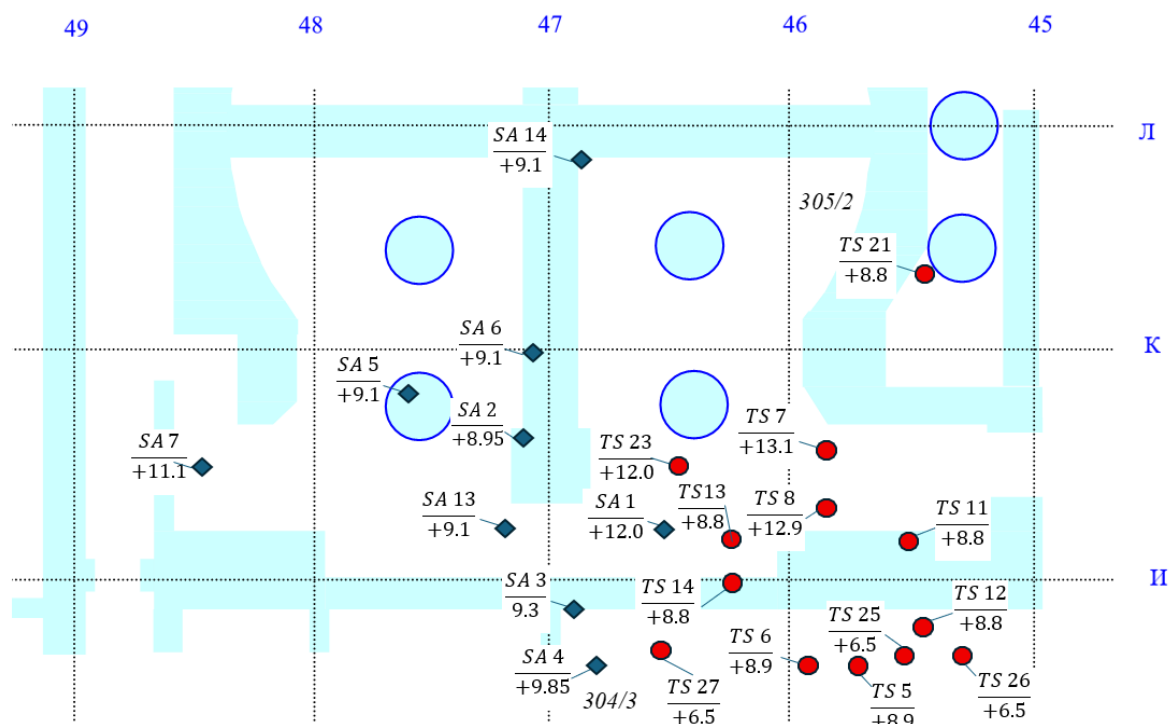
The layout of NFD and GDR SA and concrete TS onto the plane of +9.10 m elevation in the 305/2 room. (See color Figure on the journal website.)
